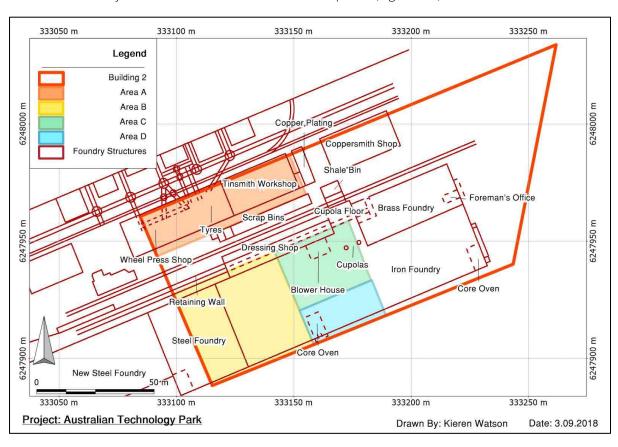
Building 2 Excavation and Monitoring zone with former Foundry plan overlaid (Source: Curio 2018)
